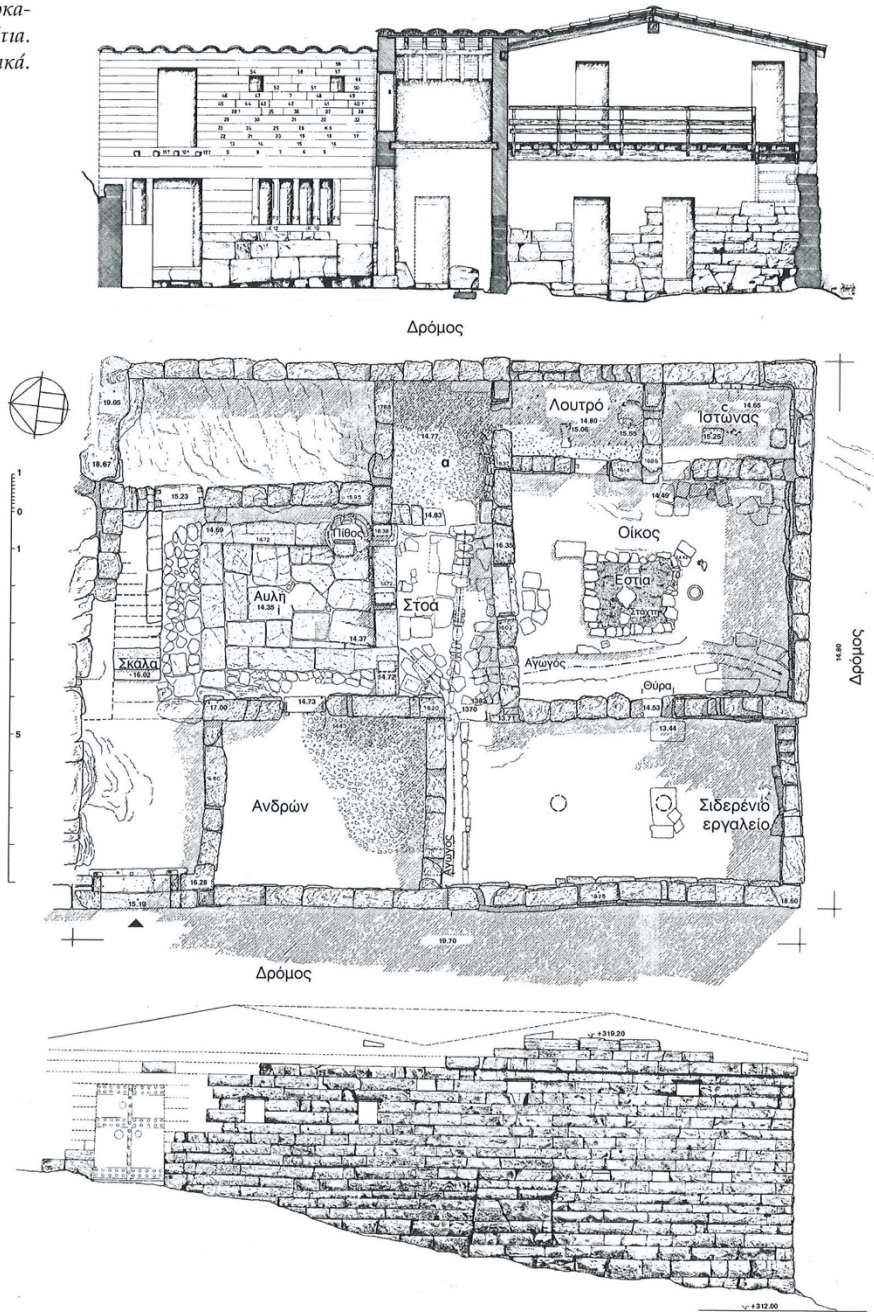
Plan of House 1 at Horraon (Hoepfner et al. 2005b, 415)
